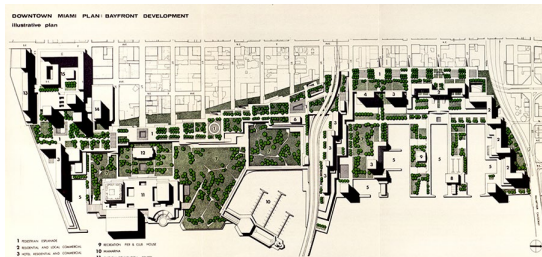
Downtown Miami Plan Bayfront Development Landscape Illustrative plan (DOX-USA-MM4, DOX-USA-MM9) Downtown Miami Plans 1966-1968 Ref. 23489)
